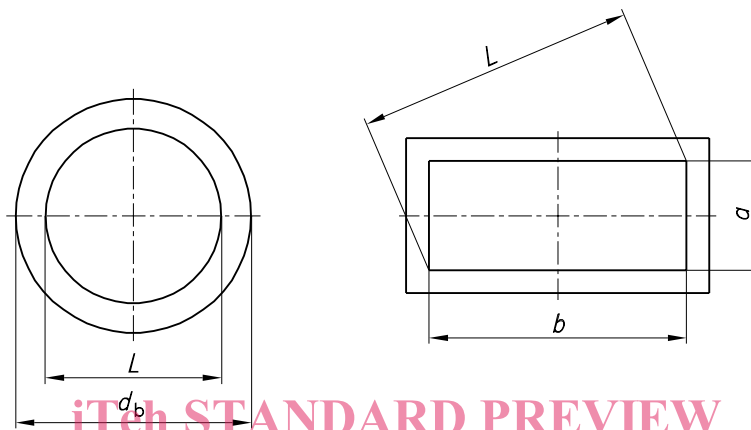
Plan dimensions of spherical and cylindrical bearings
